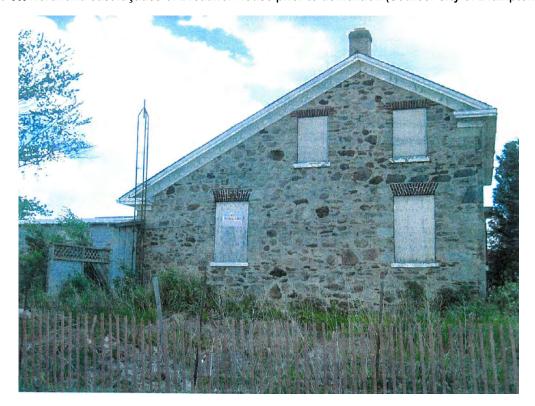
North façade of Breadner House prior to demolition (Source: City of Brampton 2009)
